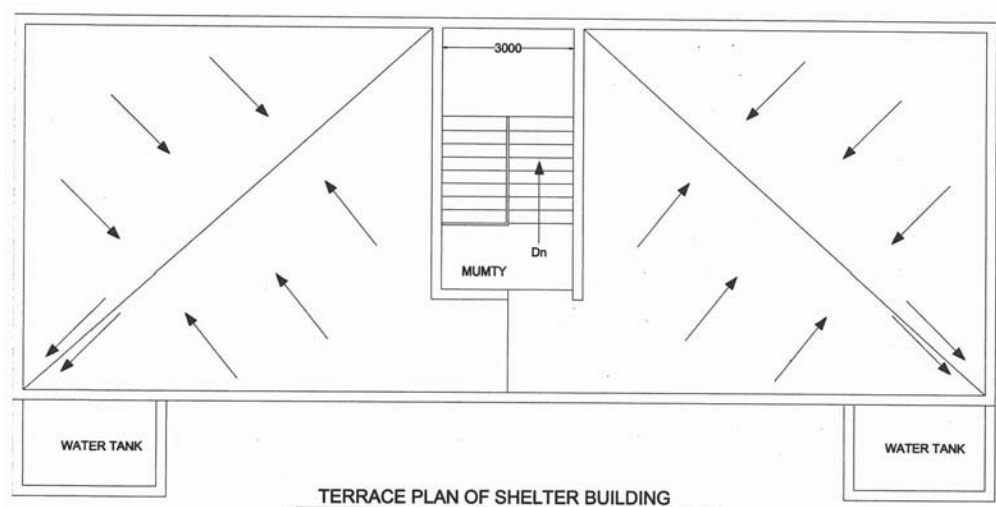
Terrace Plan showing slopes for water water flow to tanks.
